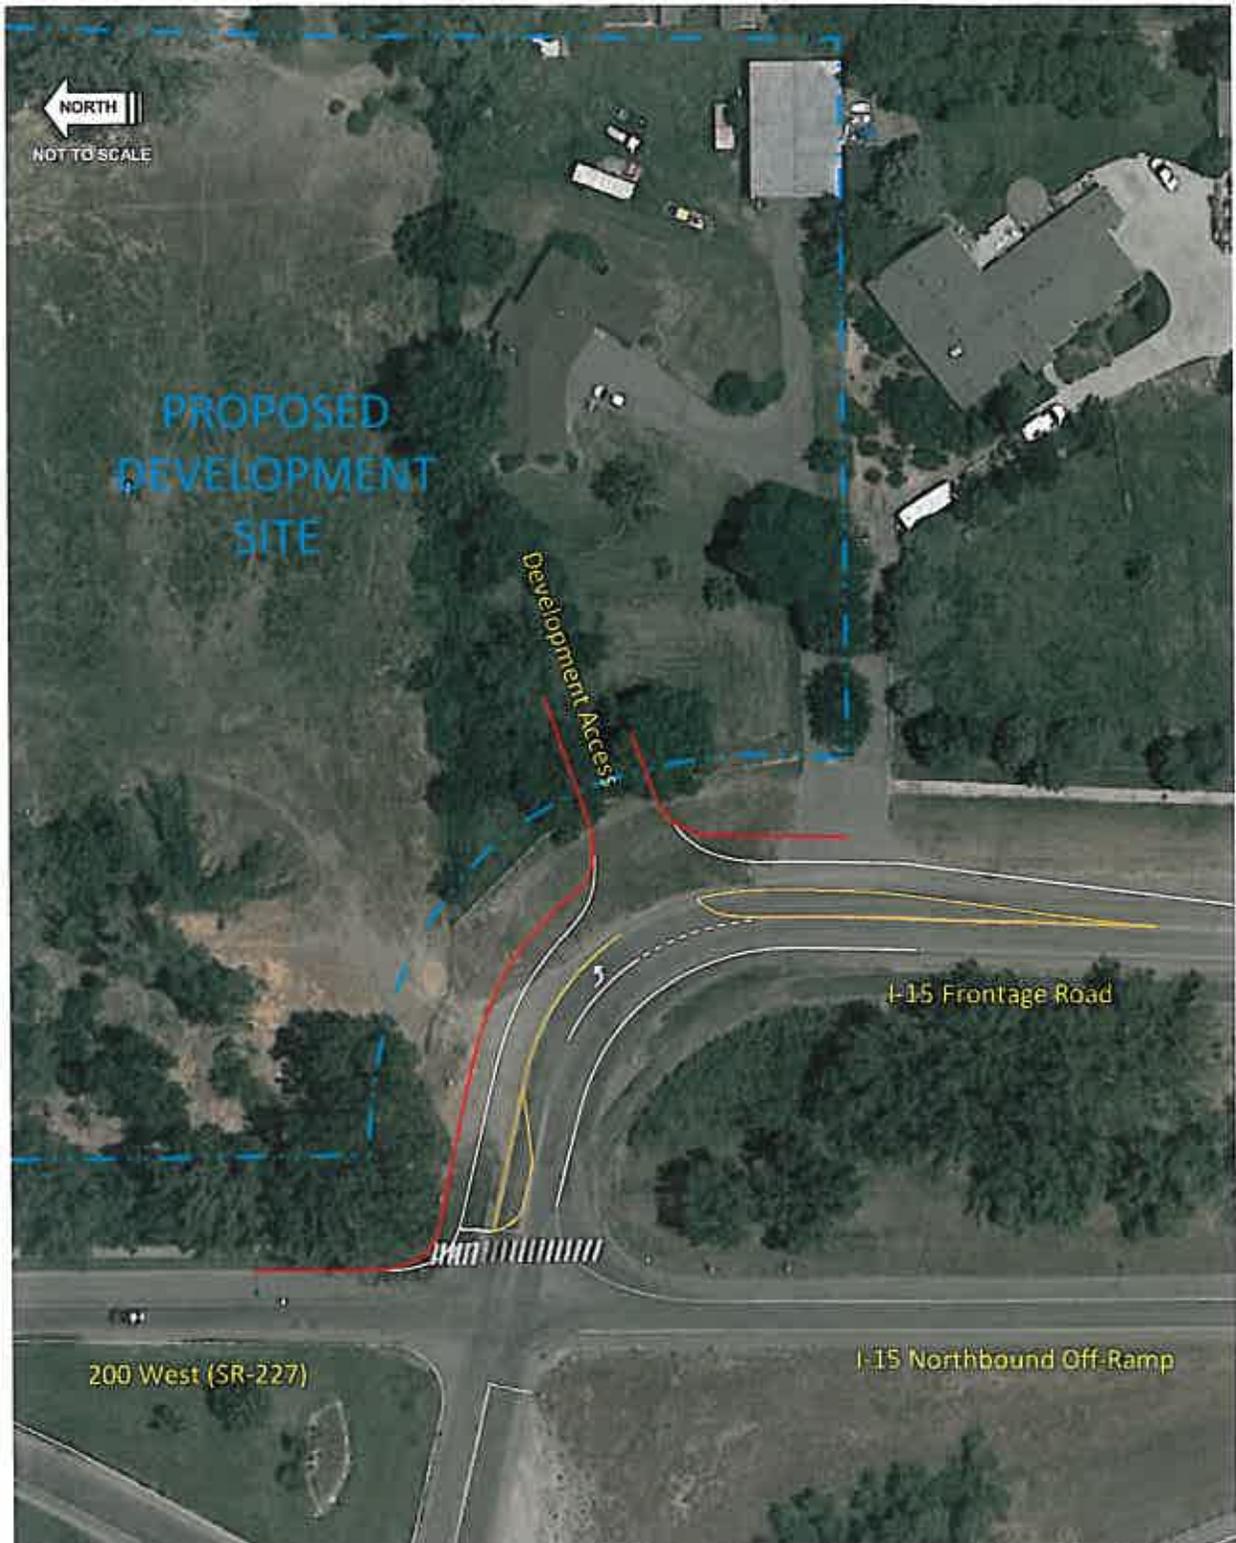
I-15 Frontage Road Widening and Left-Turn Ingress Improvement Concept
